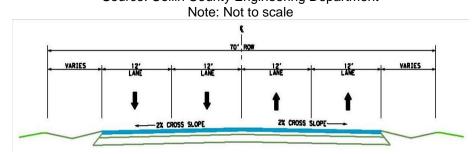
Typical Section – P4U and M4U Four Lanes Undivided
